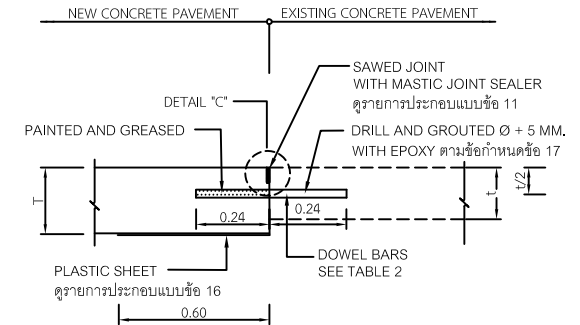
DETAIL OF JOINT BETWEEN NEW AND EXISTING CONCRETE PAVEMENT (TRANSVERSE JOINT)
